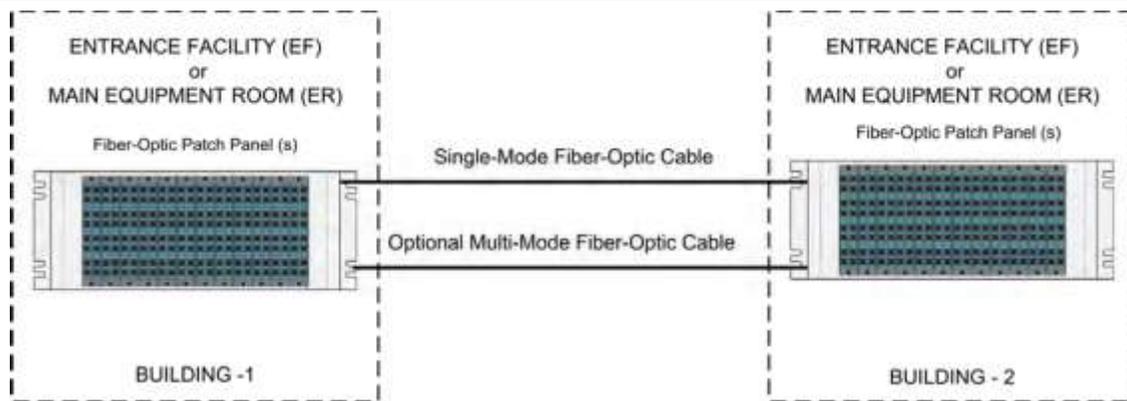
Main Equipment Room (ER) to Main Equipment Room (ER) Inter-Building Fiber-Optic Backbone Cable System
